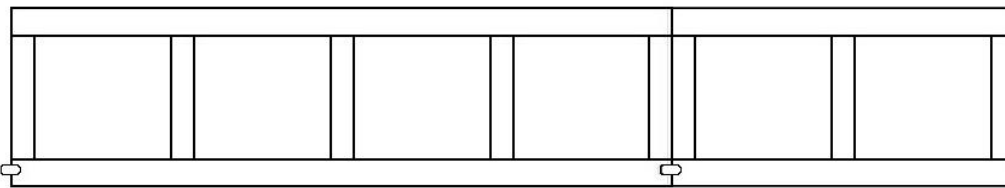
Illustration of the Lignatur sandwich floor system.
